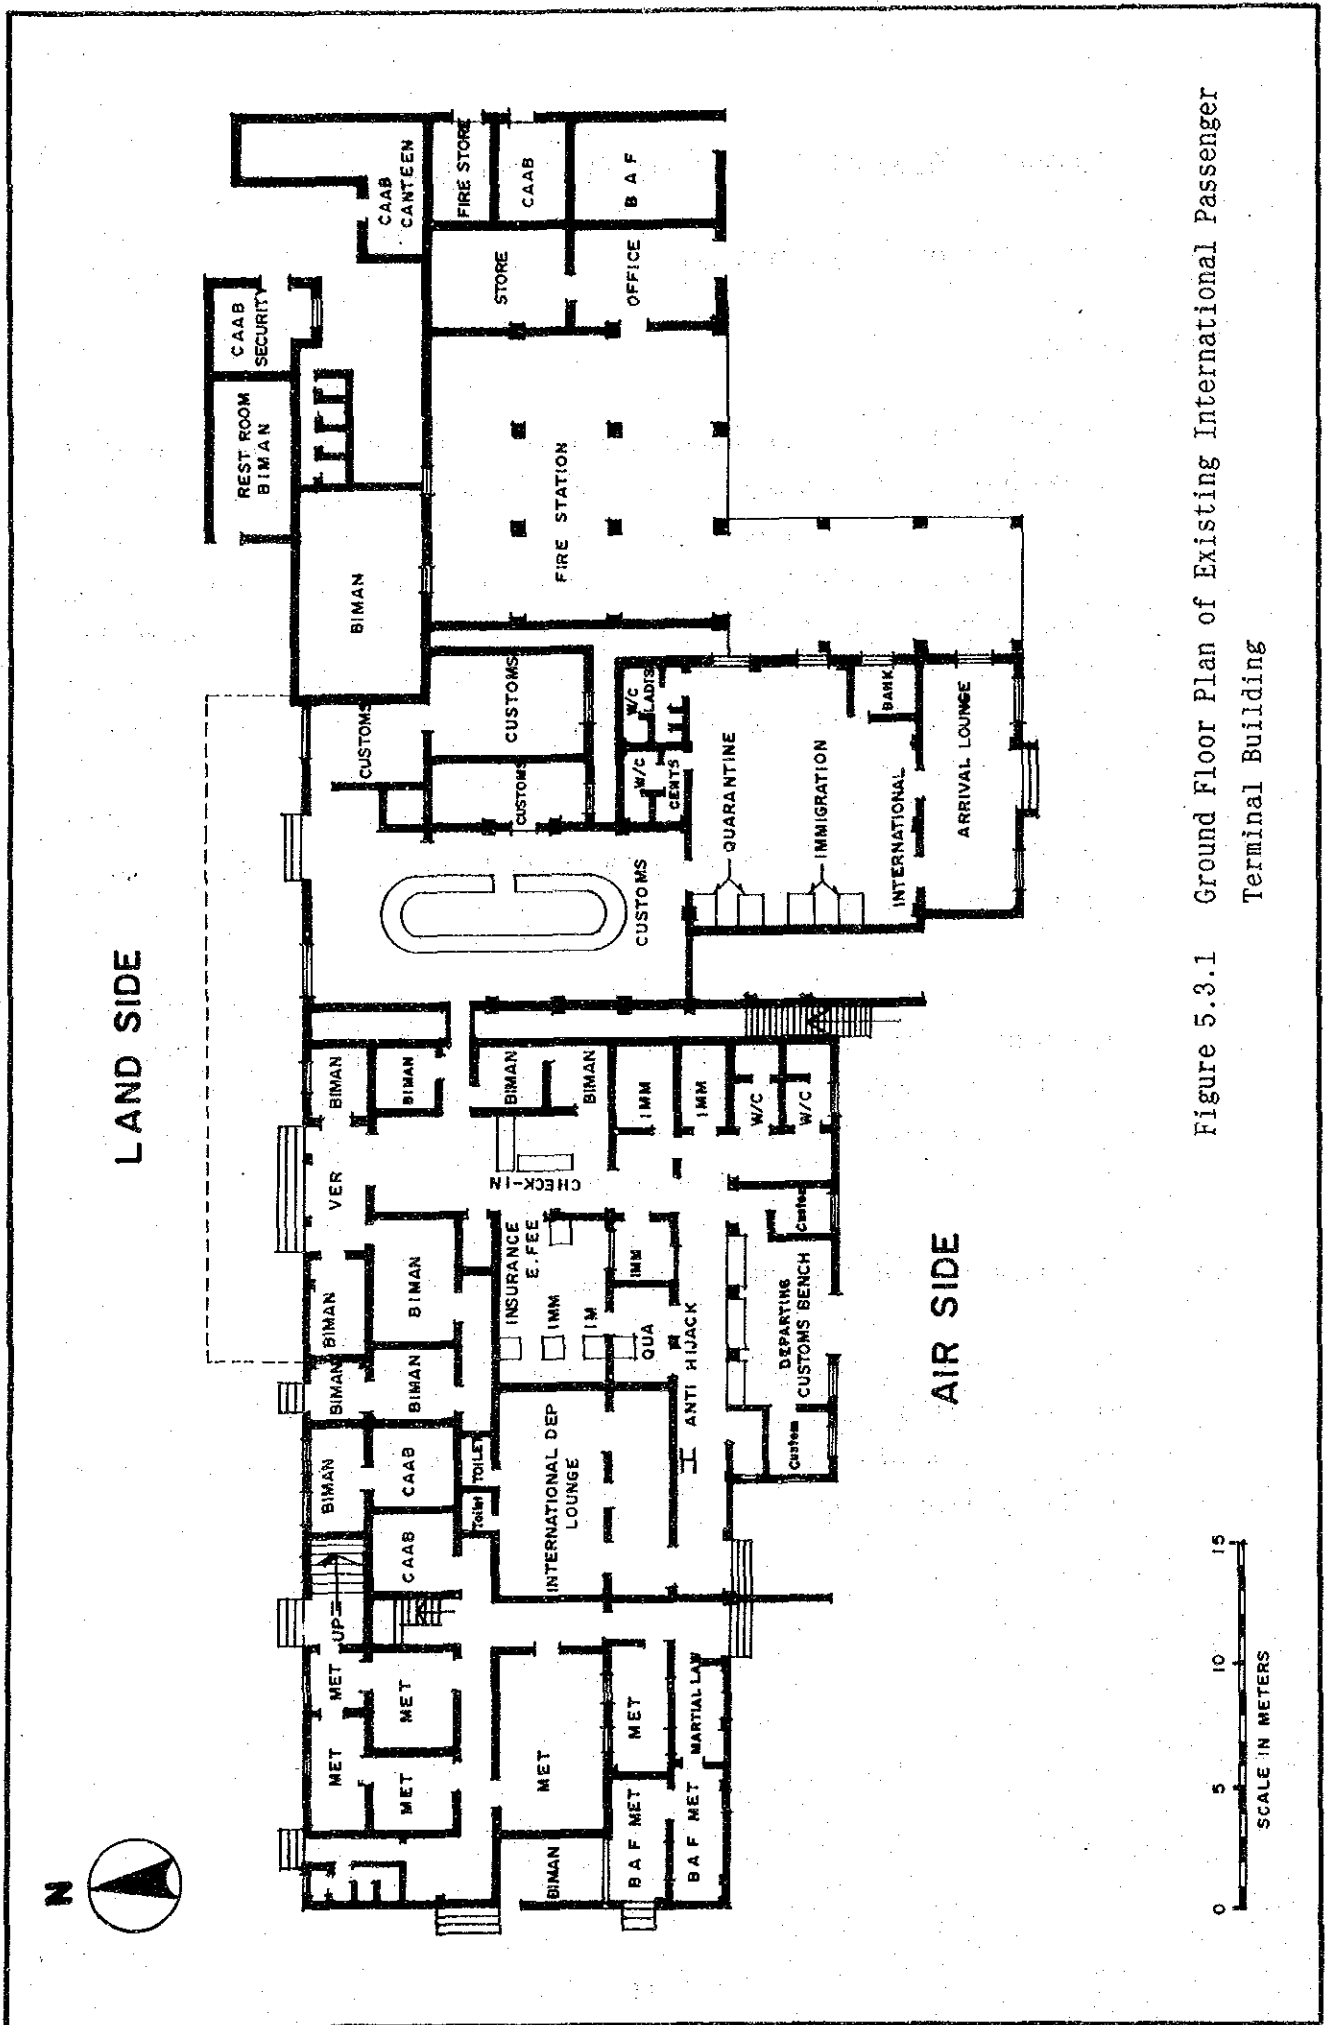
Ground Floor Plan of Existing International Passenger Terminal Building
